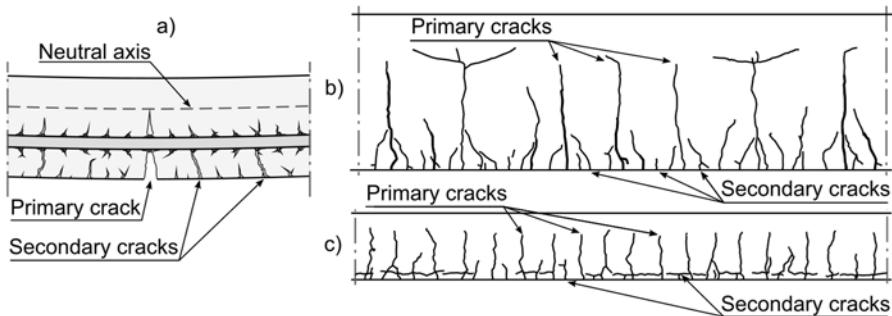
Primary and secondary crack pattern: a) schematic view; b) Beam R103 (Rüsch & Rehm 1964); c) Beam 8 (Calderón Bello 2008)
